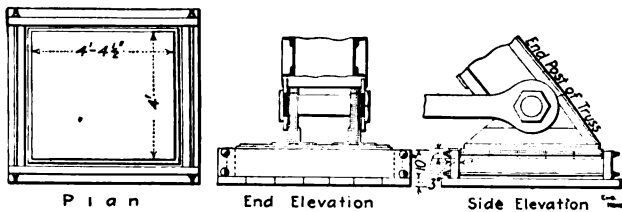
SAND JACKS FOR SUPPORTING THE BRIDGE TRUSSES ON BLOCKING AND LOWERING THEM UPON THE TRUCKS READY FOR MOVEMENT
